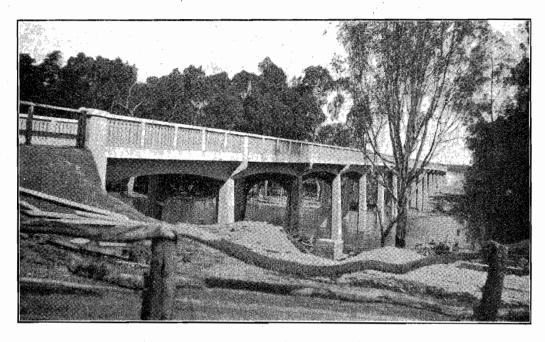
Reinforced Concrete Bridge over Loddon River at Eddington.
